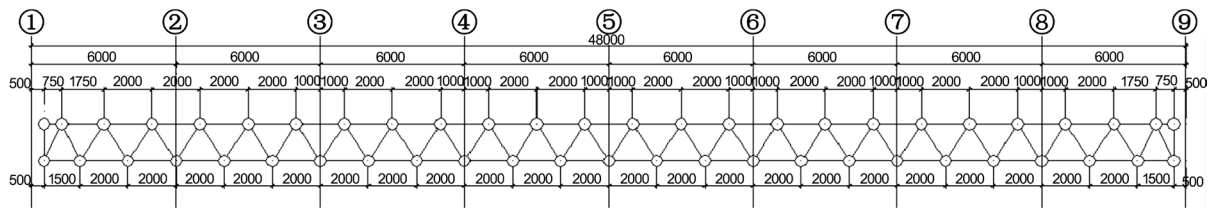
Face-up diagram of welded hollow spherical joint flat grid structure
